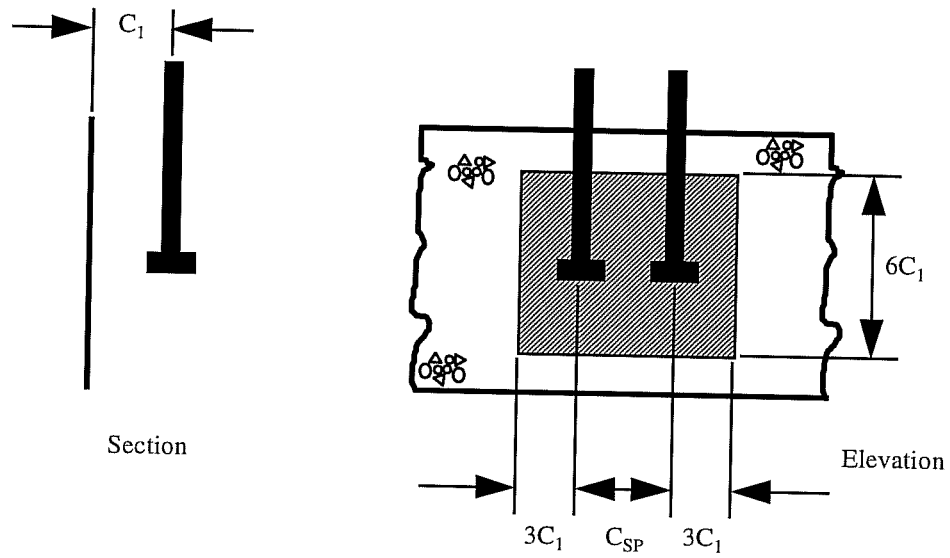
CEB Blowout Failure Area for Close Spacing
